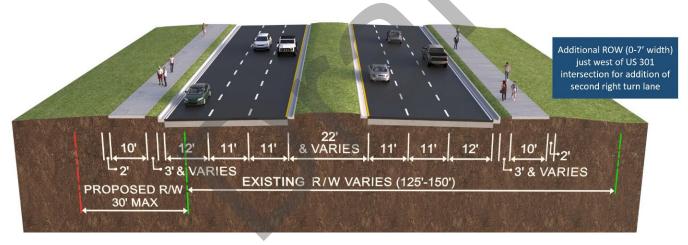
Gibsonton Drive Preferred Alternative Typical Section
